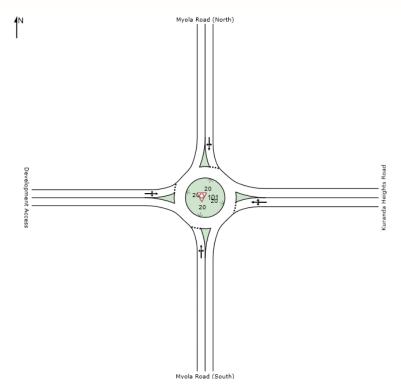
Proposed Myola Road / Kuranda Heights Road / Development Access intersection from Stage 1B (2021) onwards.
